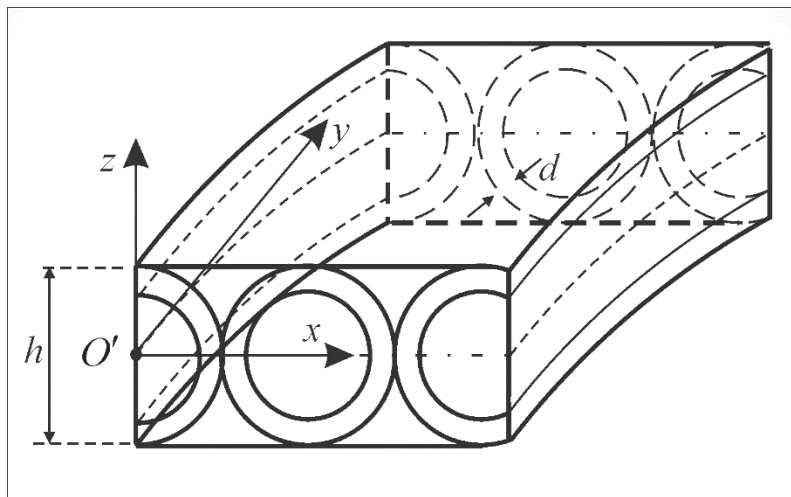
Scheme of the structure wall, mounted пустотілими трубками
